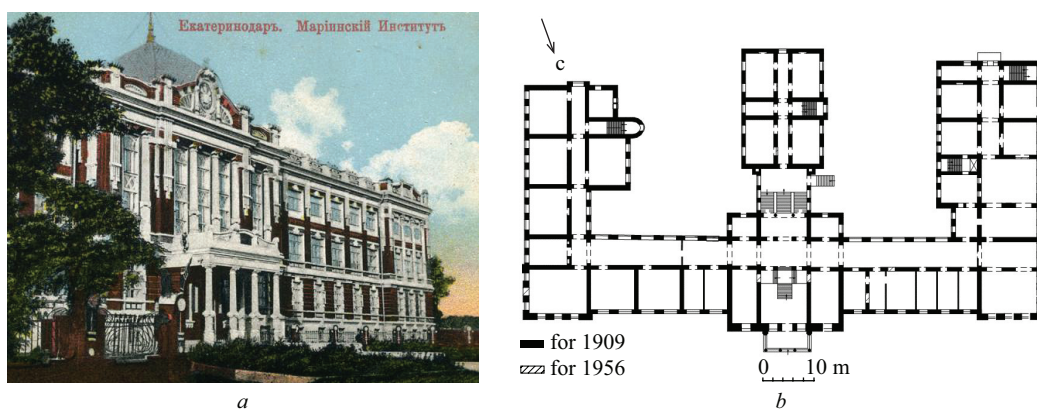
The building of the Kuban Mariinsky Women's Institute (a) (photo about 1913² year); plan of the 1st floor (b) (GAKK, F. R-1765, O. 4, D. 37)
